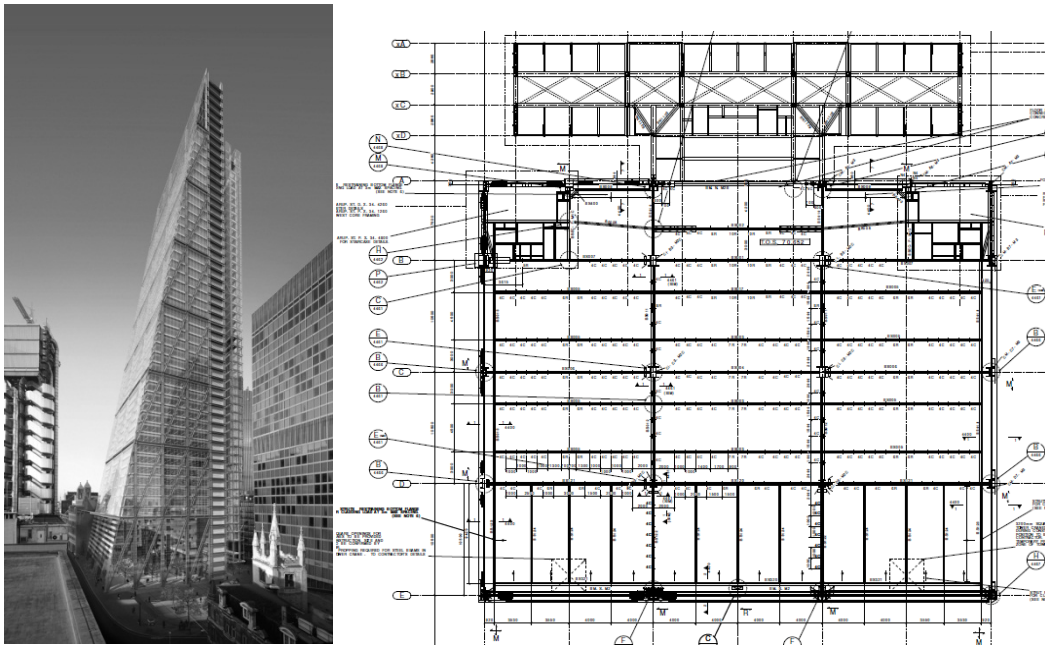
The Leadenhall Building design, architectural image (left), sample structural floor plan (right)
